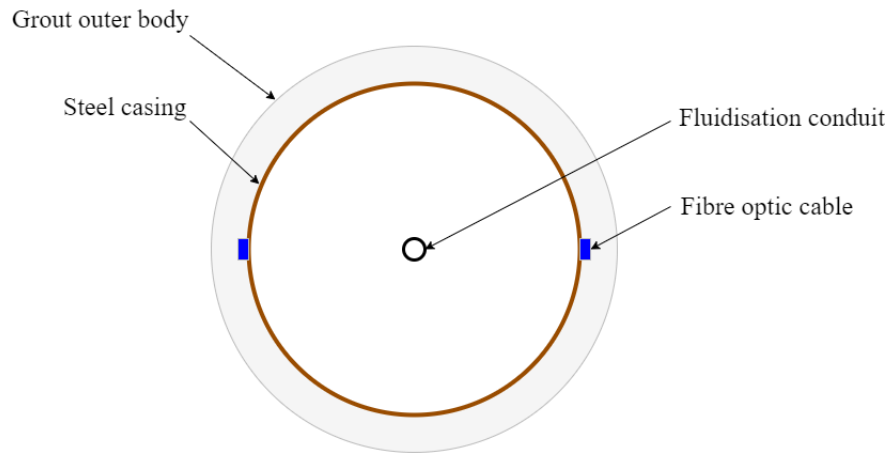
Cross-section of the SIc piles (not drawn to scale) including instrumentation. The fluidisation conduit was used to house a telltale during pile testing
